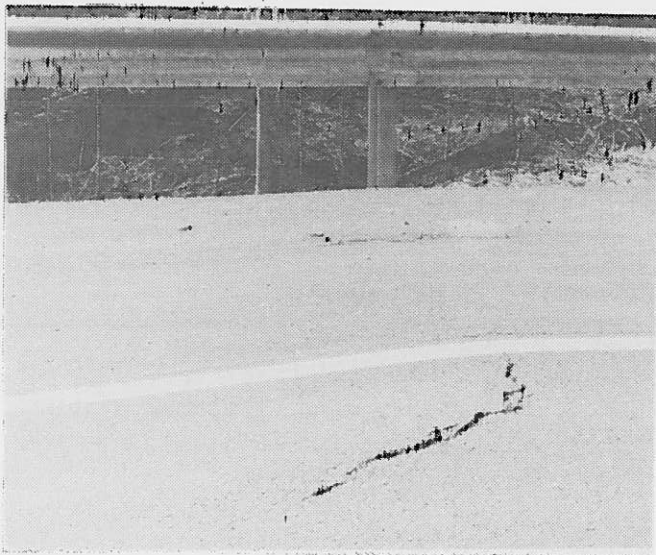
Close-up view of cracked pavement and hump on Ky Route 11
